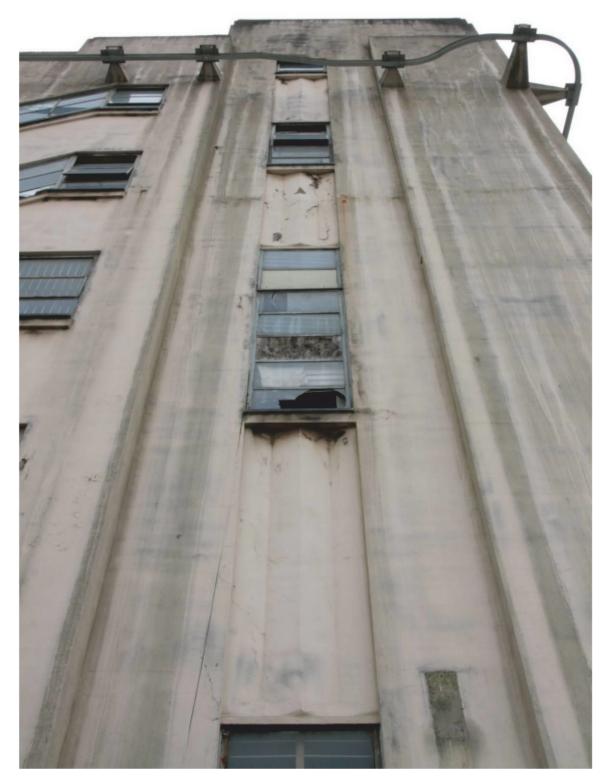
Recessed chevron detailing to stair-bay (south) and external track
